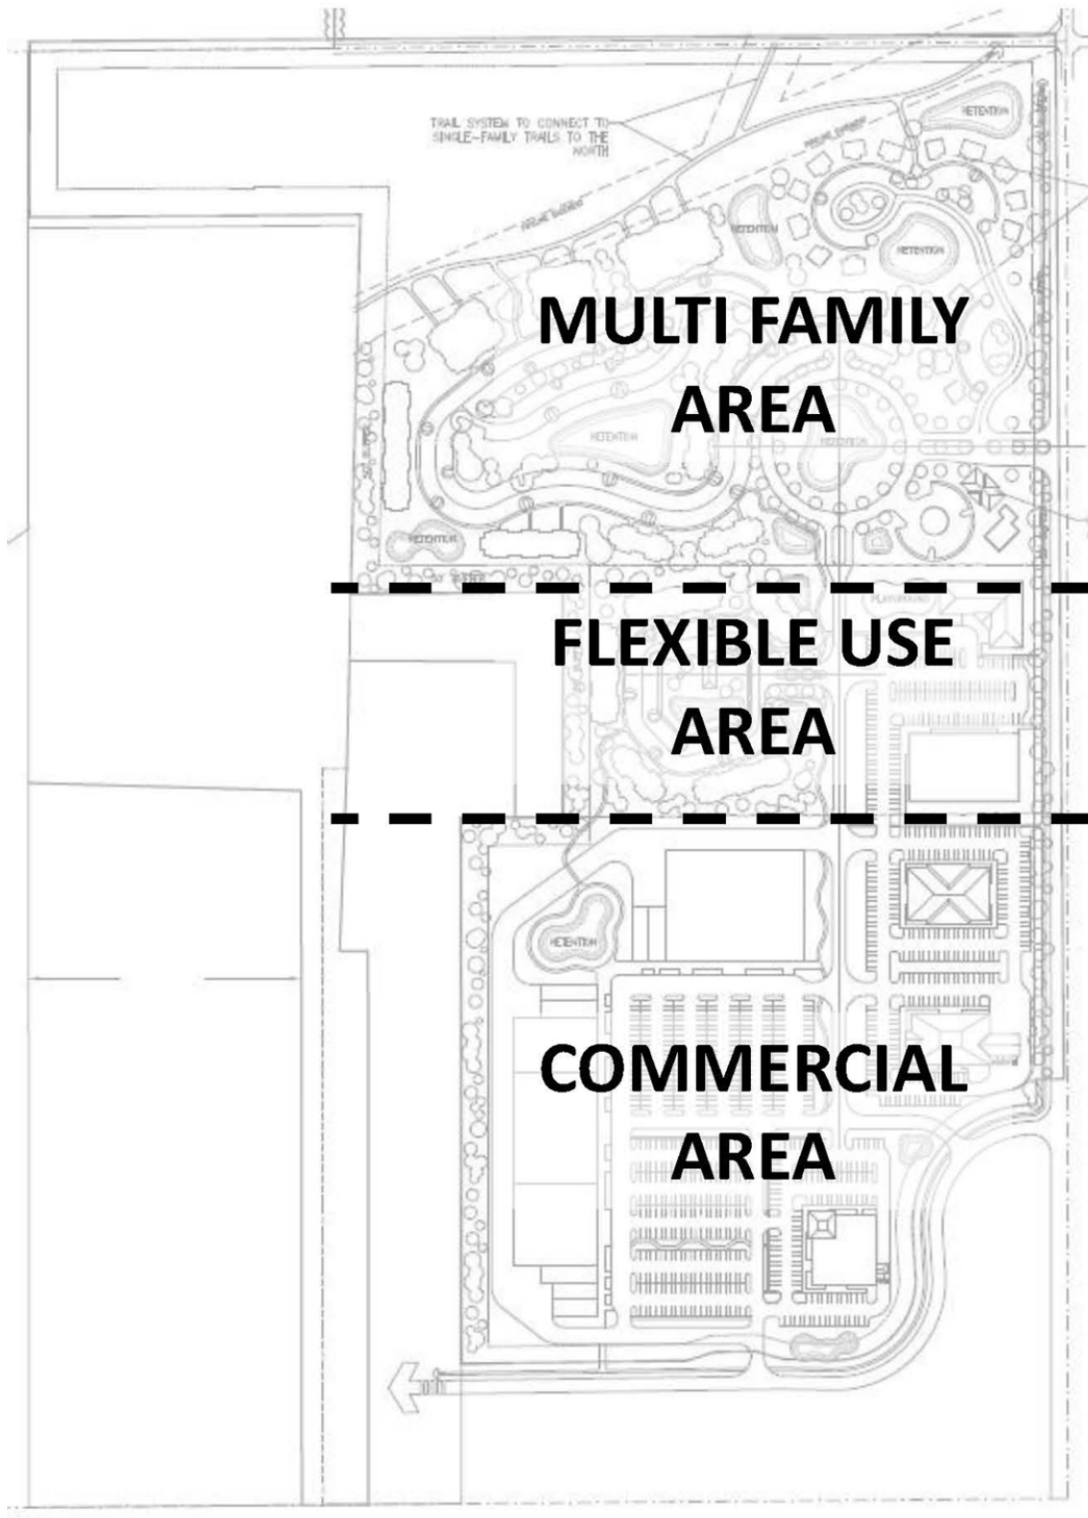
B: Commercial / Flexible Use / Multi-Family Area Concept Plan
